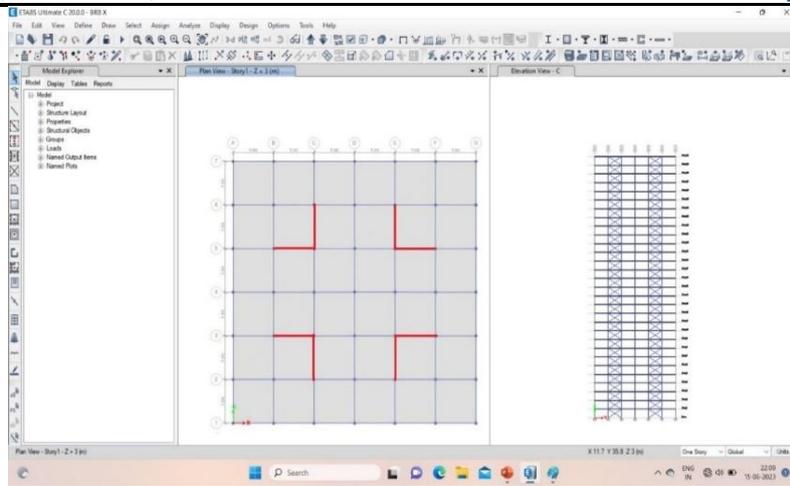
Diagrid building with X-arrangement of secondary bracing.
